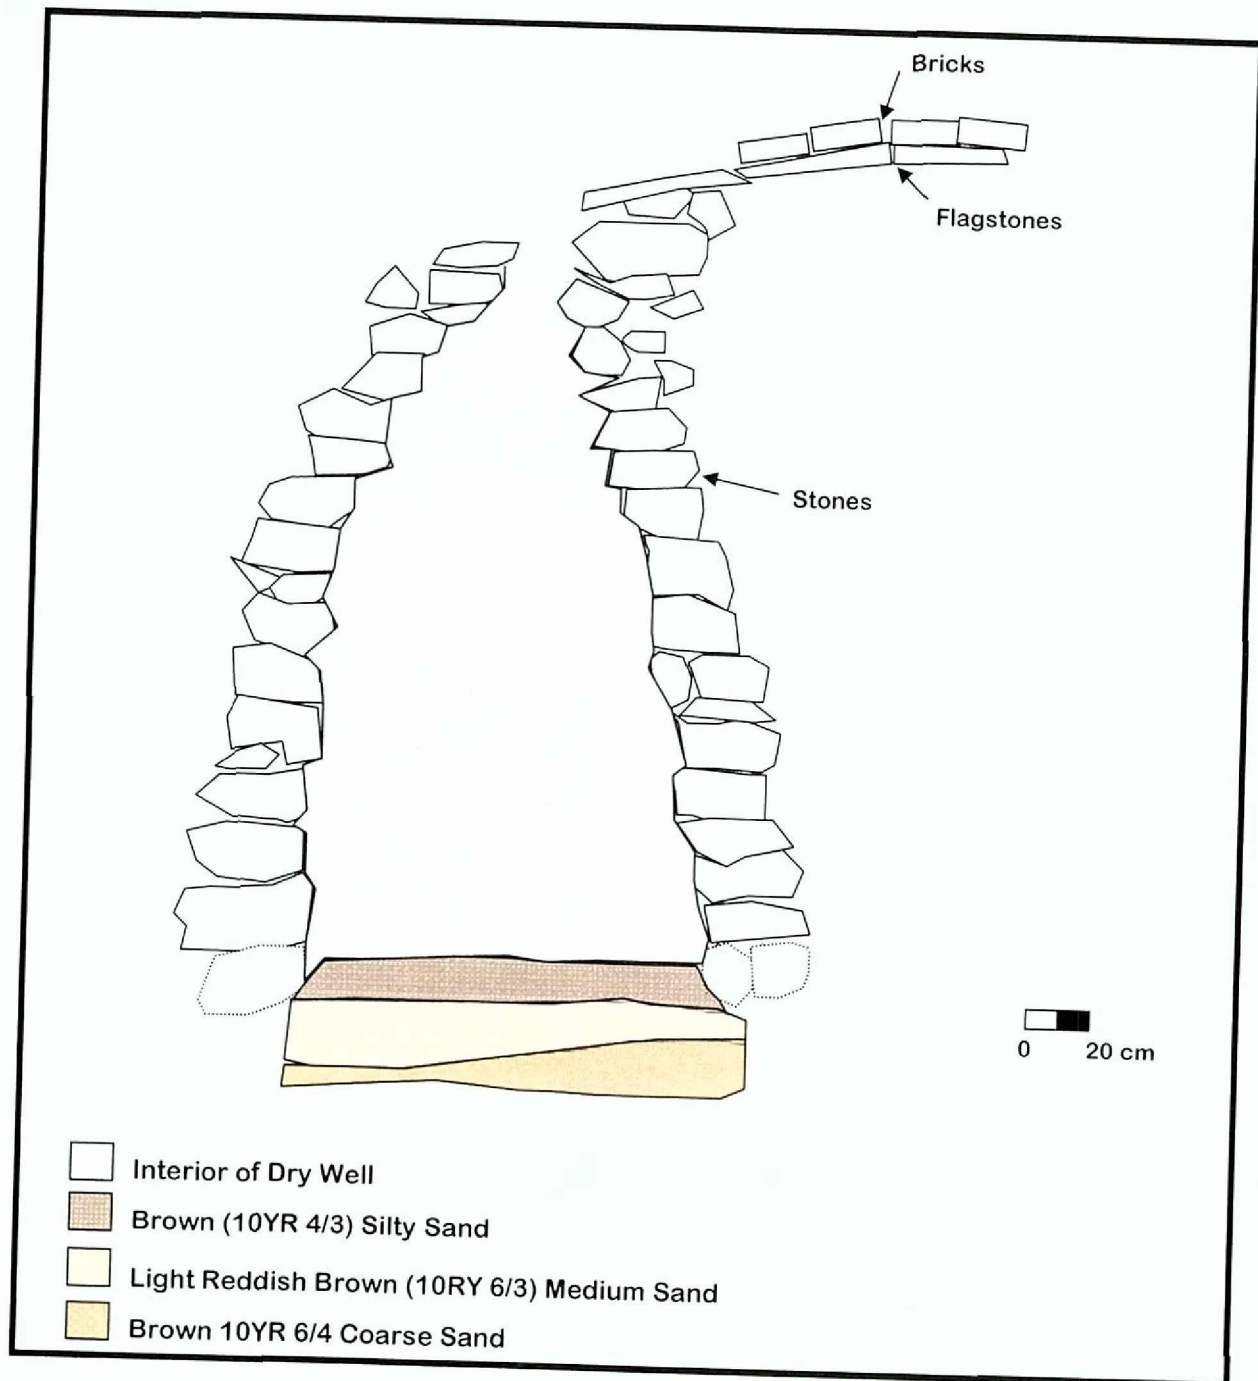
34 Bond Street, Section of Stone Dry Well.
